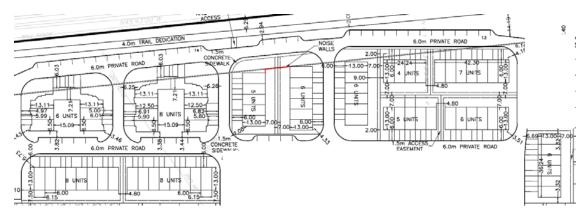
Proposed Townhouse Units within Preliminary Site Plan, prepared by IBI Group
